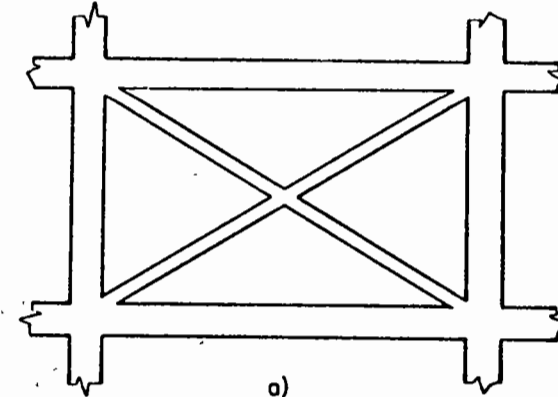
Cracking of reinforced concrete frame due to its interaction with infilling wall panel. After Esteva and Nieto (1967).
